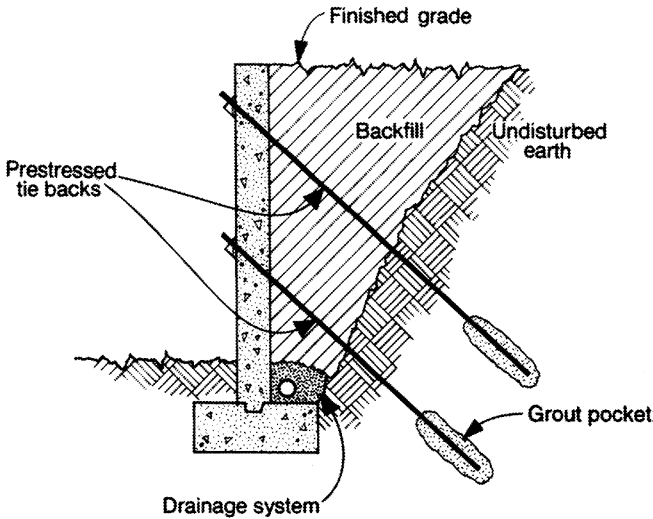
Retaining wall with prestressed tiebacks.
